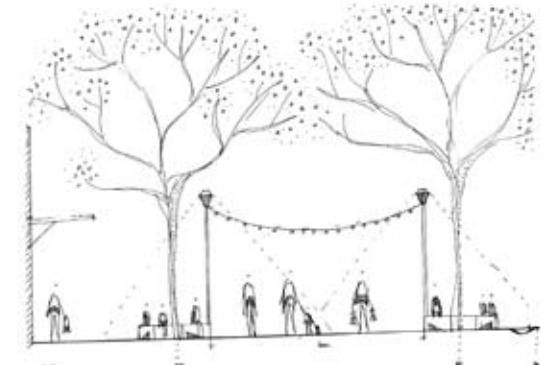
Proposed section through Bloed Street Boulevard (Author, 2009)
